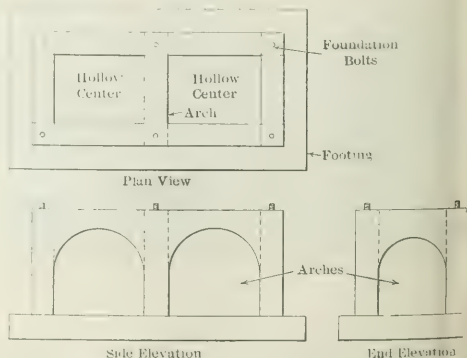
Machine Foundation with Intermediate Bearing Support.
